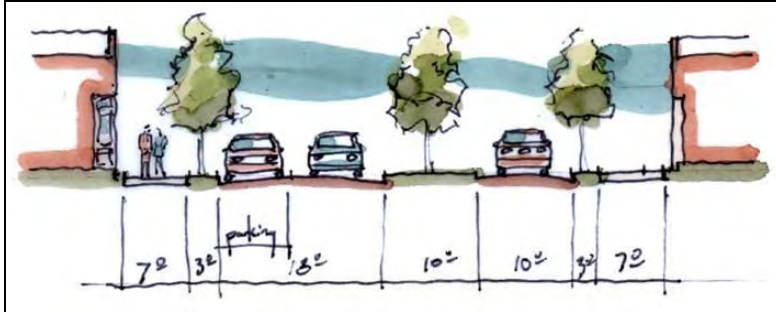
Possible commercial core or mixed-use street with on-street parking, street trees, and wide sidewalks
